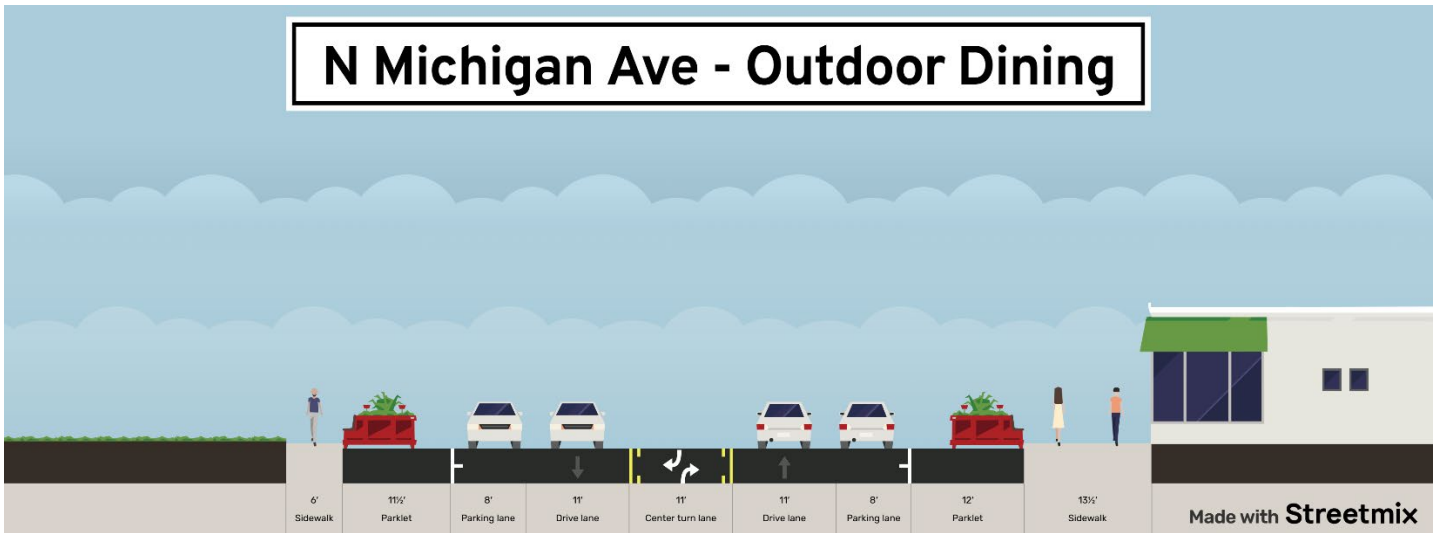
Alternative Cross Section 2B - Road Diet and Outdoor Dining Space
